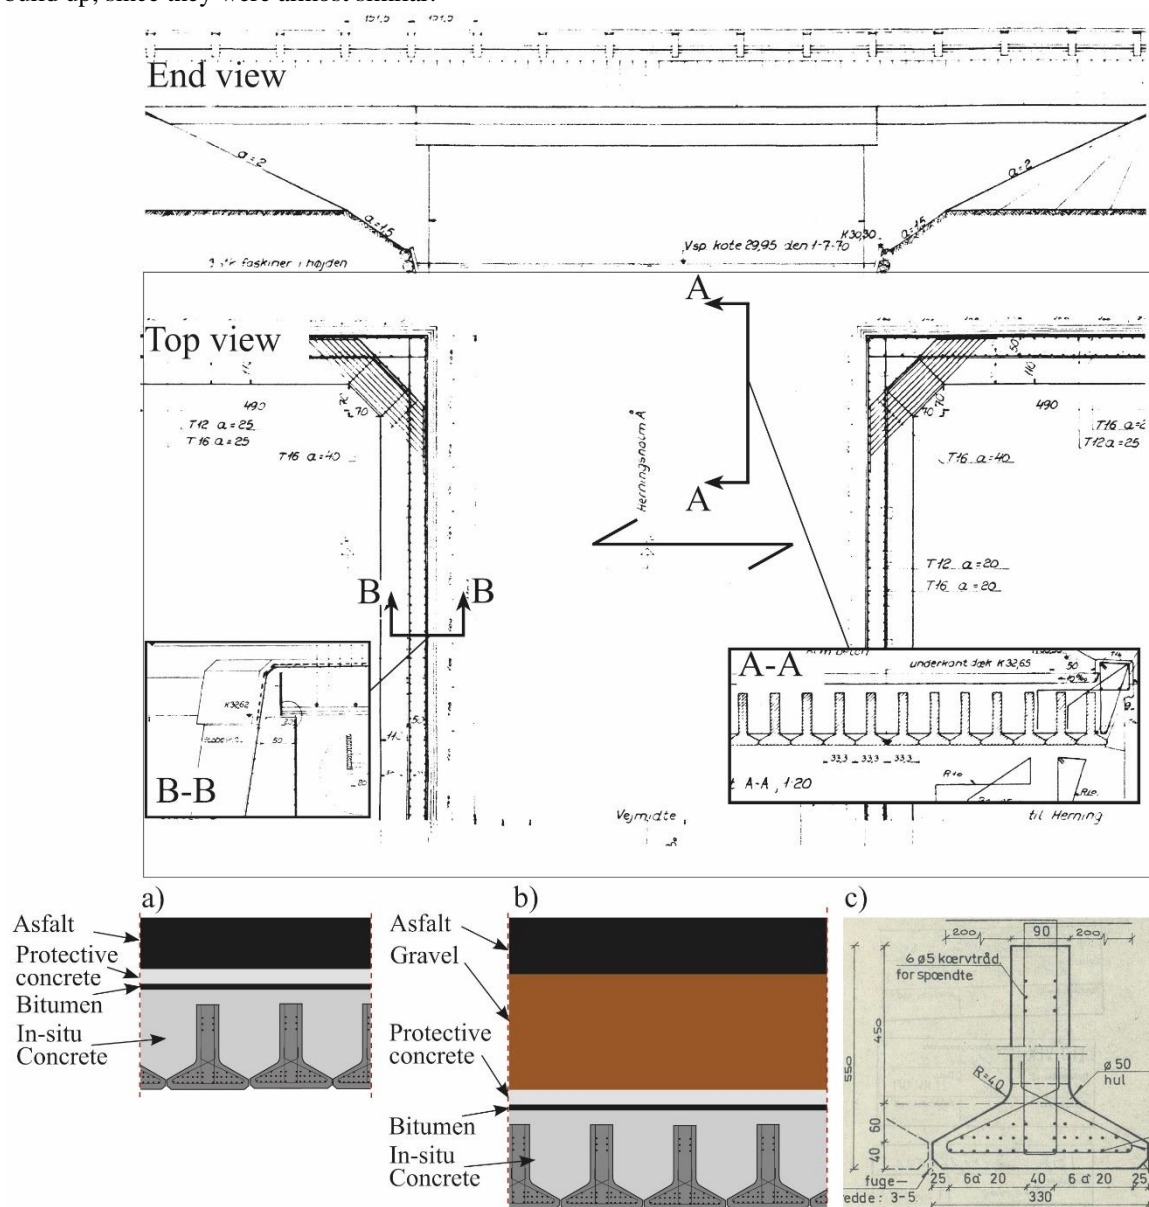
End- and top view from bridge #1 as well as section view from original drawings. a) Build-up of cross section without gravel (not in scale), b) Build-up of cross section with gravel (not in scale) and c) OT-beam cross section.
